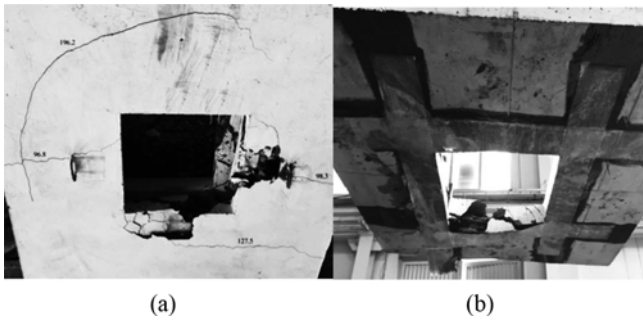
The Failure Mode and Cracking Pattern for Slab SOGC1: (a) Compression Side, (b) Tension Side
